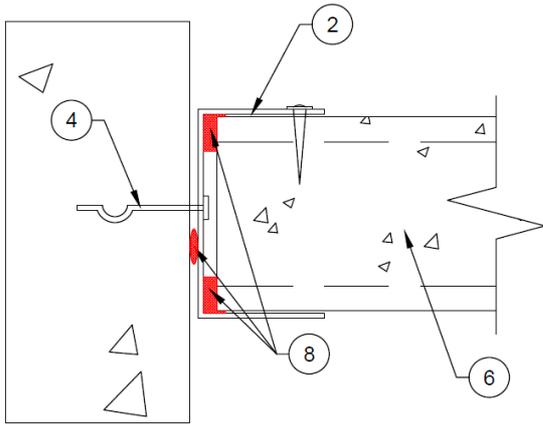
Cut-off Panel End Detail for Vertical Speedpanel Wall
